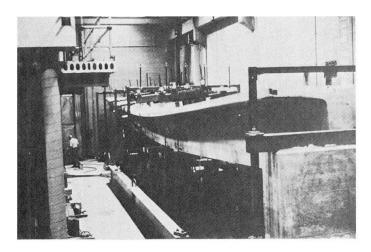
Repetitive Loading Setup Fig. 5 - Girder No. 2 at Ultimate Load.
